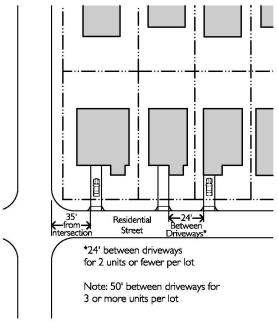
C.3.b Driveway Separation for Neighborhoods Streets
